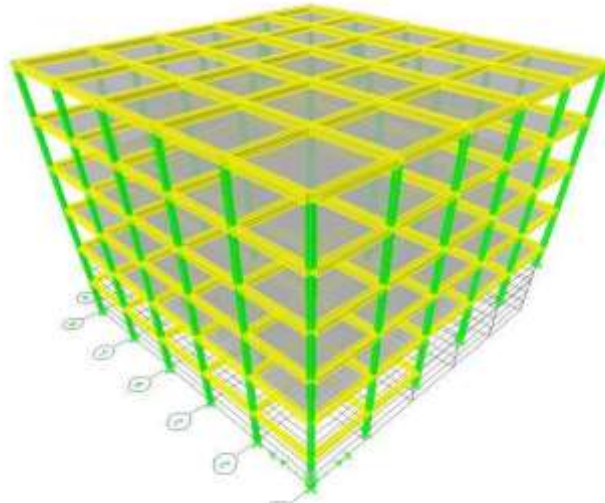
Three dimensional view of step back building for five storey model (150 slope)
